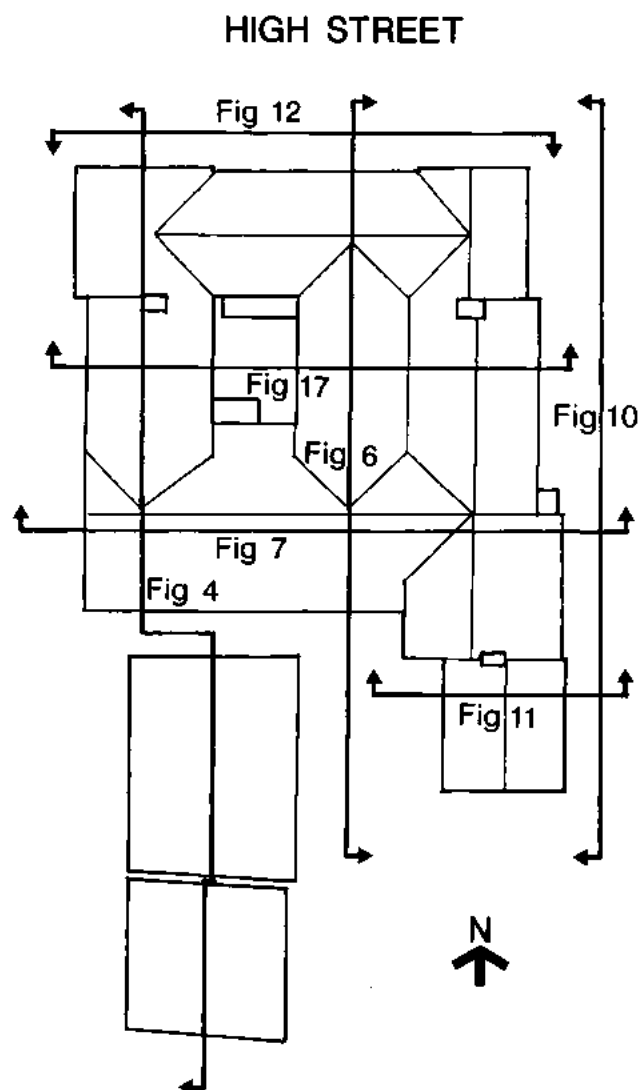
The Red Lion, Colchester. Outline plan showing positions of sections and elevations.
